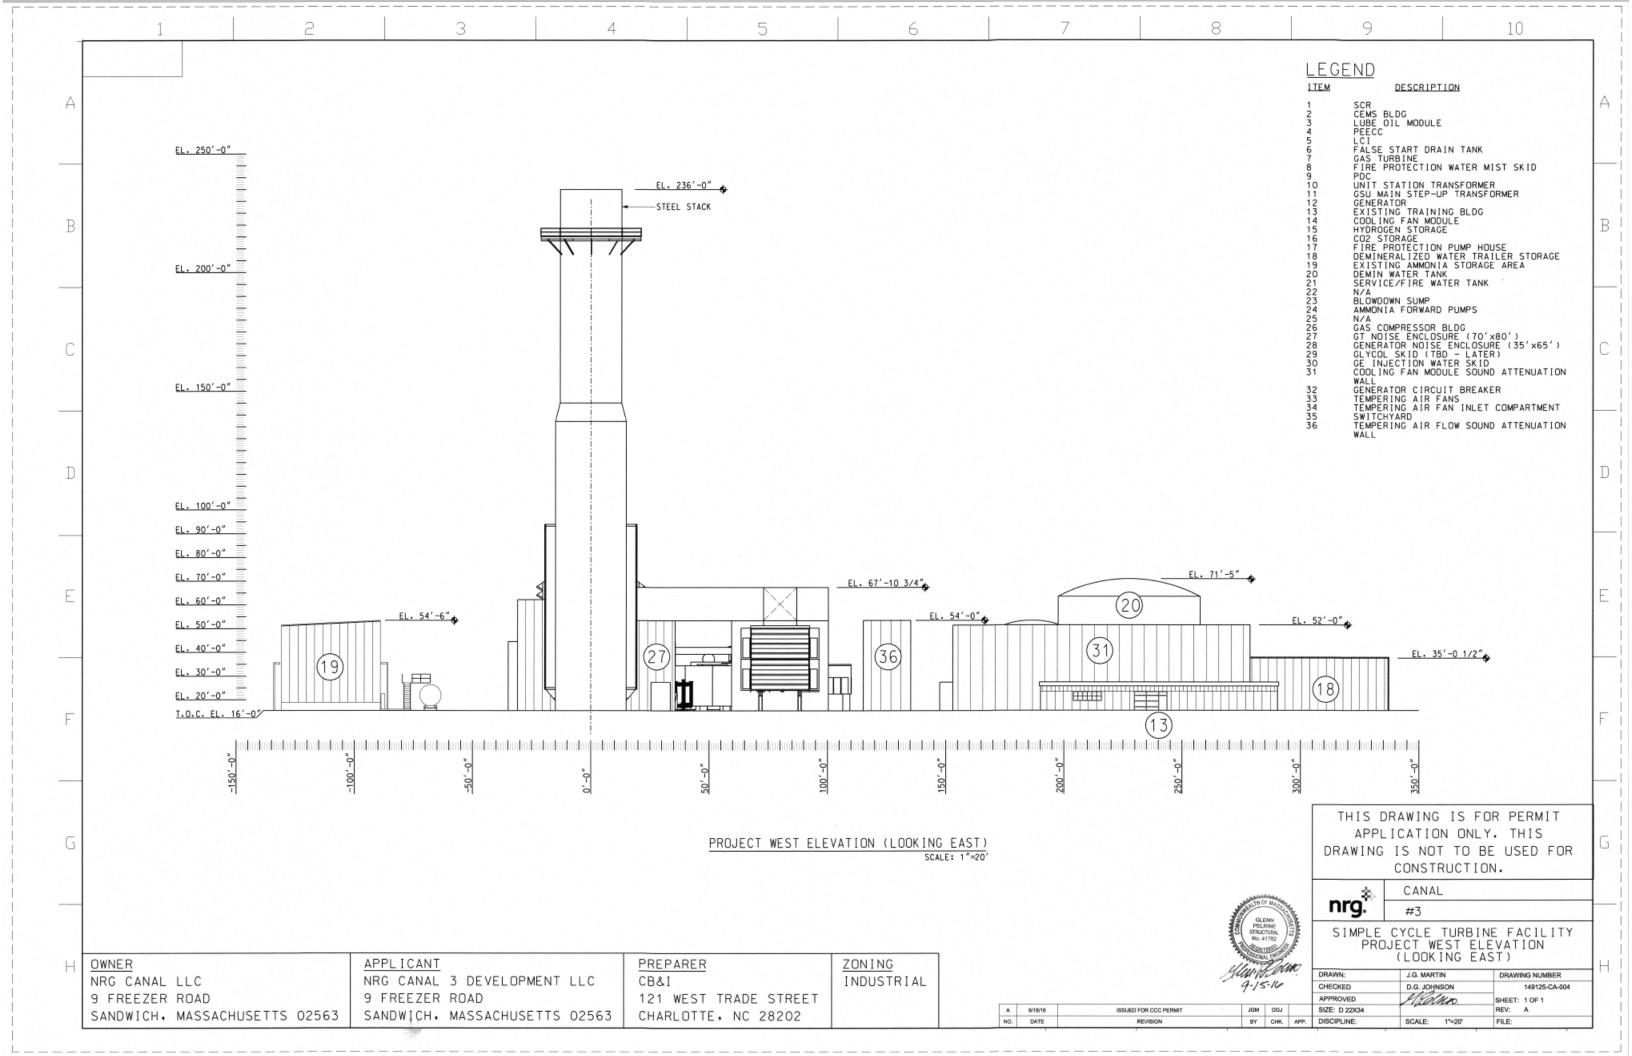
DETAILS PLAN CANAL UNIT 3 PLANT EXPANSION SANDWICH, MASSACHUSETTS 02563 SEPTEMBER 16, 2016
